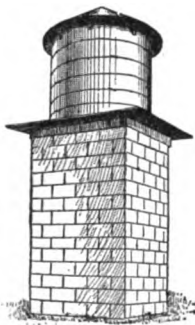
Water tank elevated on masonry base which can be used as a silo or storage building.
